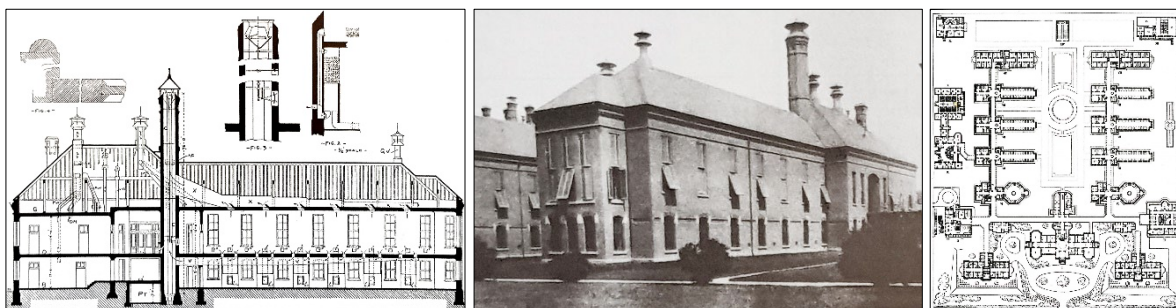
Inpatient ward section indicating the small vent openings in the sidewall between every two beds and exterior view, Elevation, and Site plan of John Hopkins Hospital (1877-1885) (Verderber 2010, p. 24).
